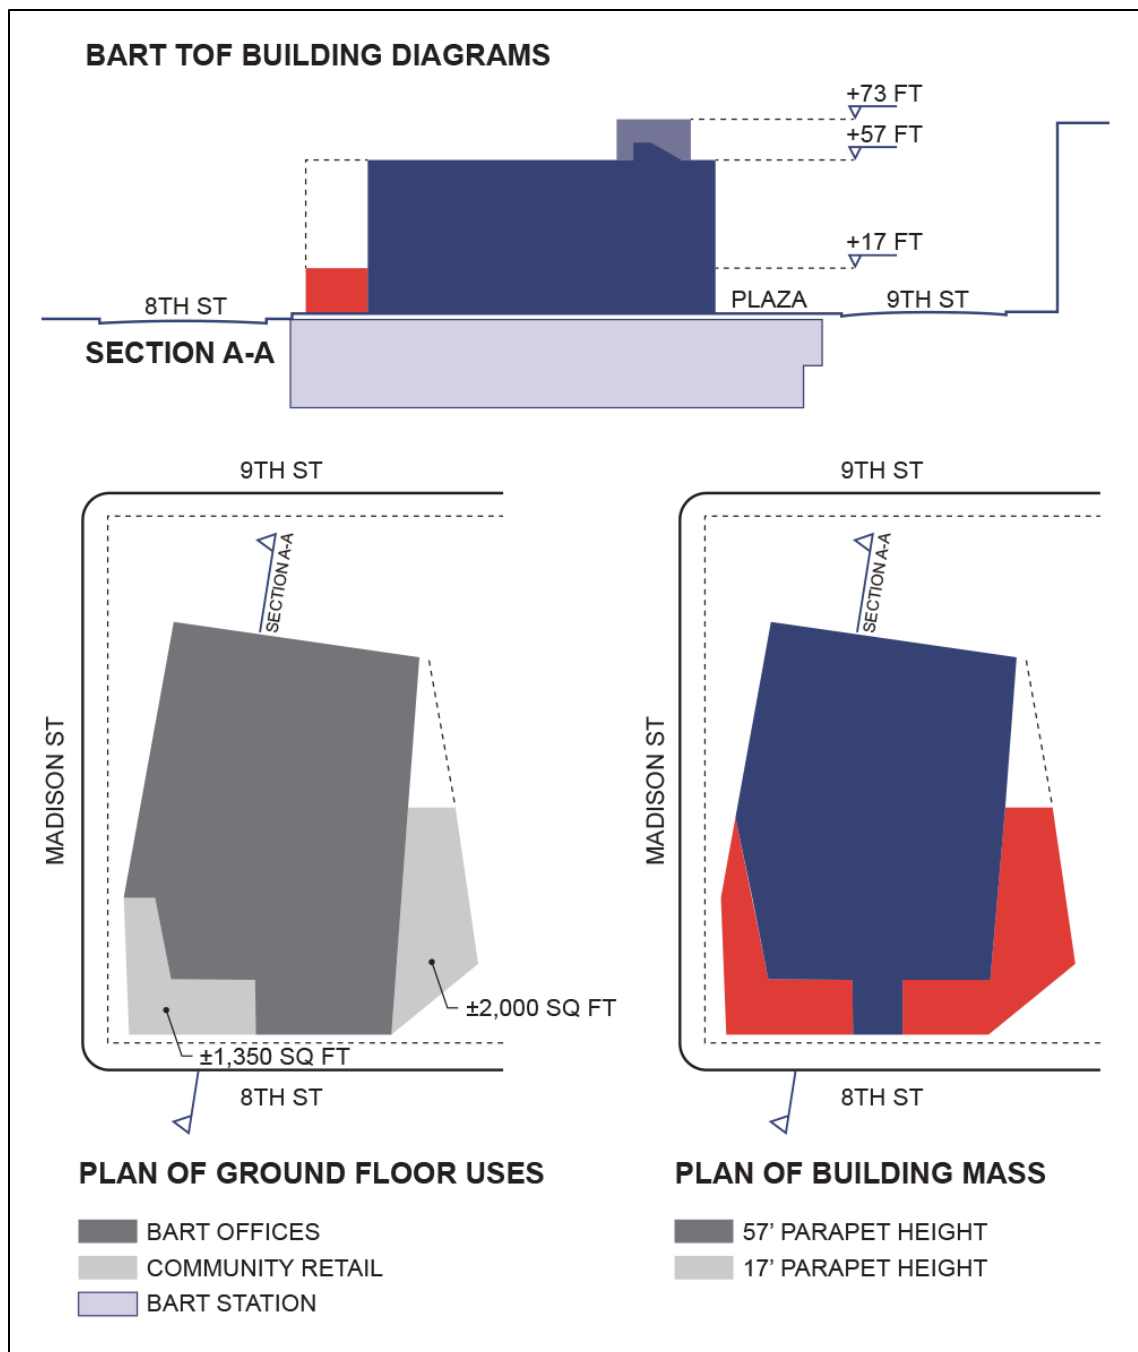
Proposed Transit Operations Facility Massing, Height, and Ground-Floor Uses
